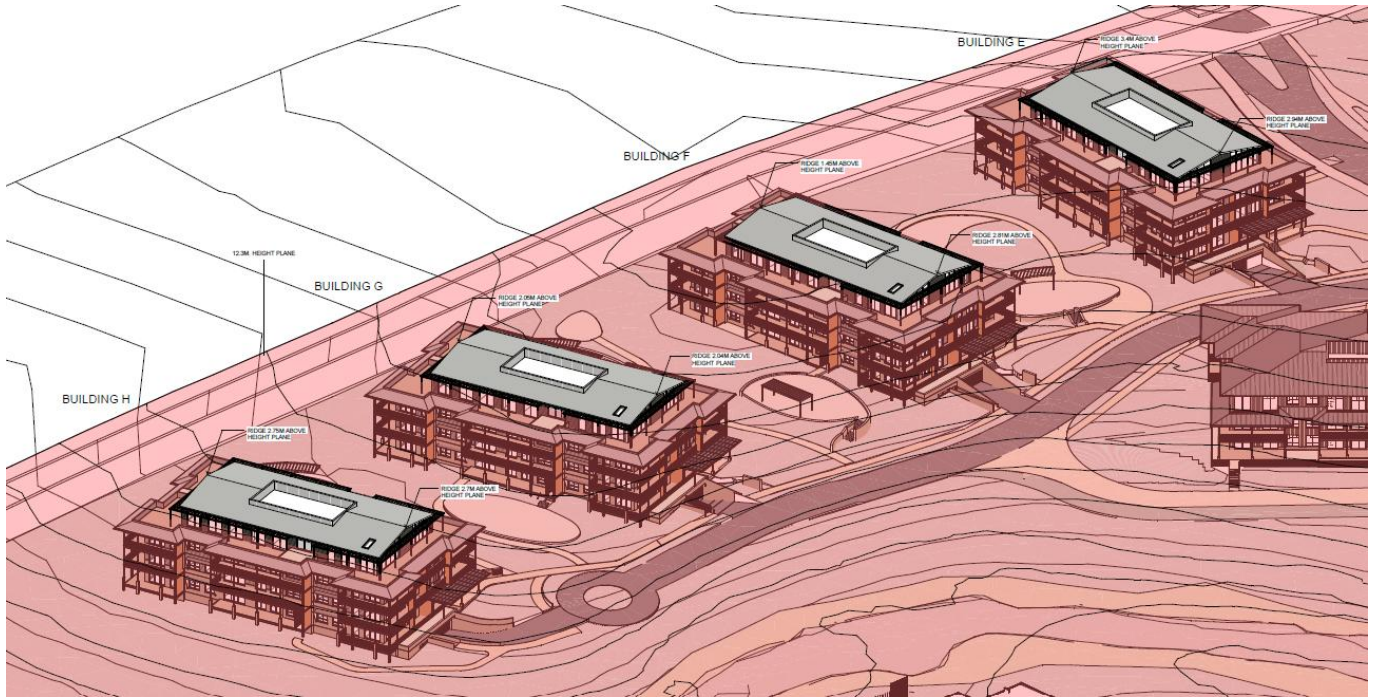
Proposed height against height plane (Spencer Street Apartments)
